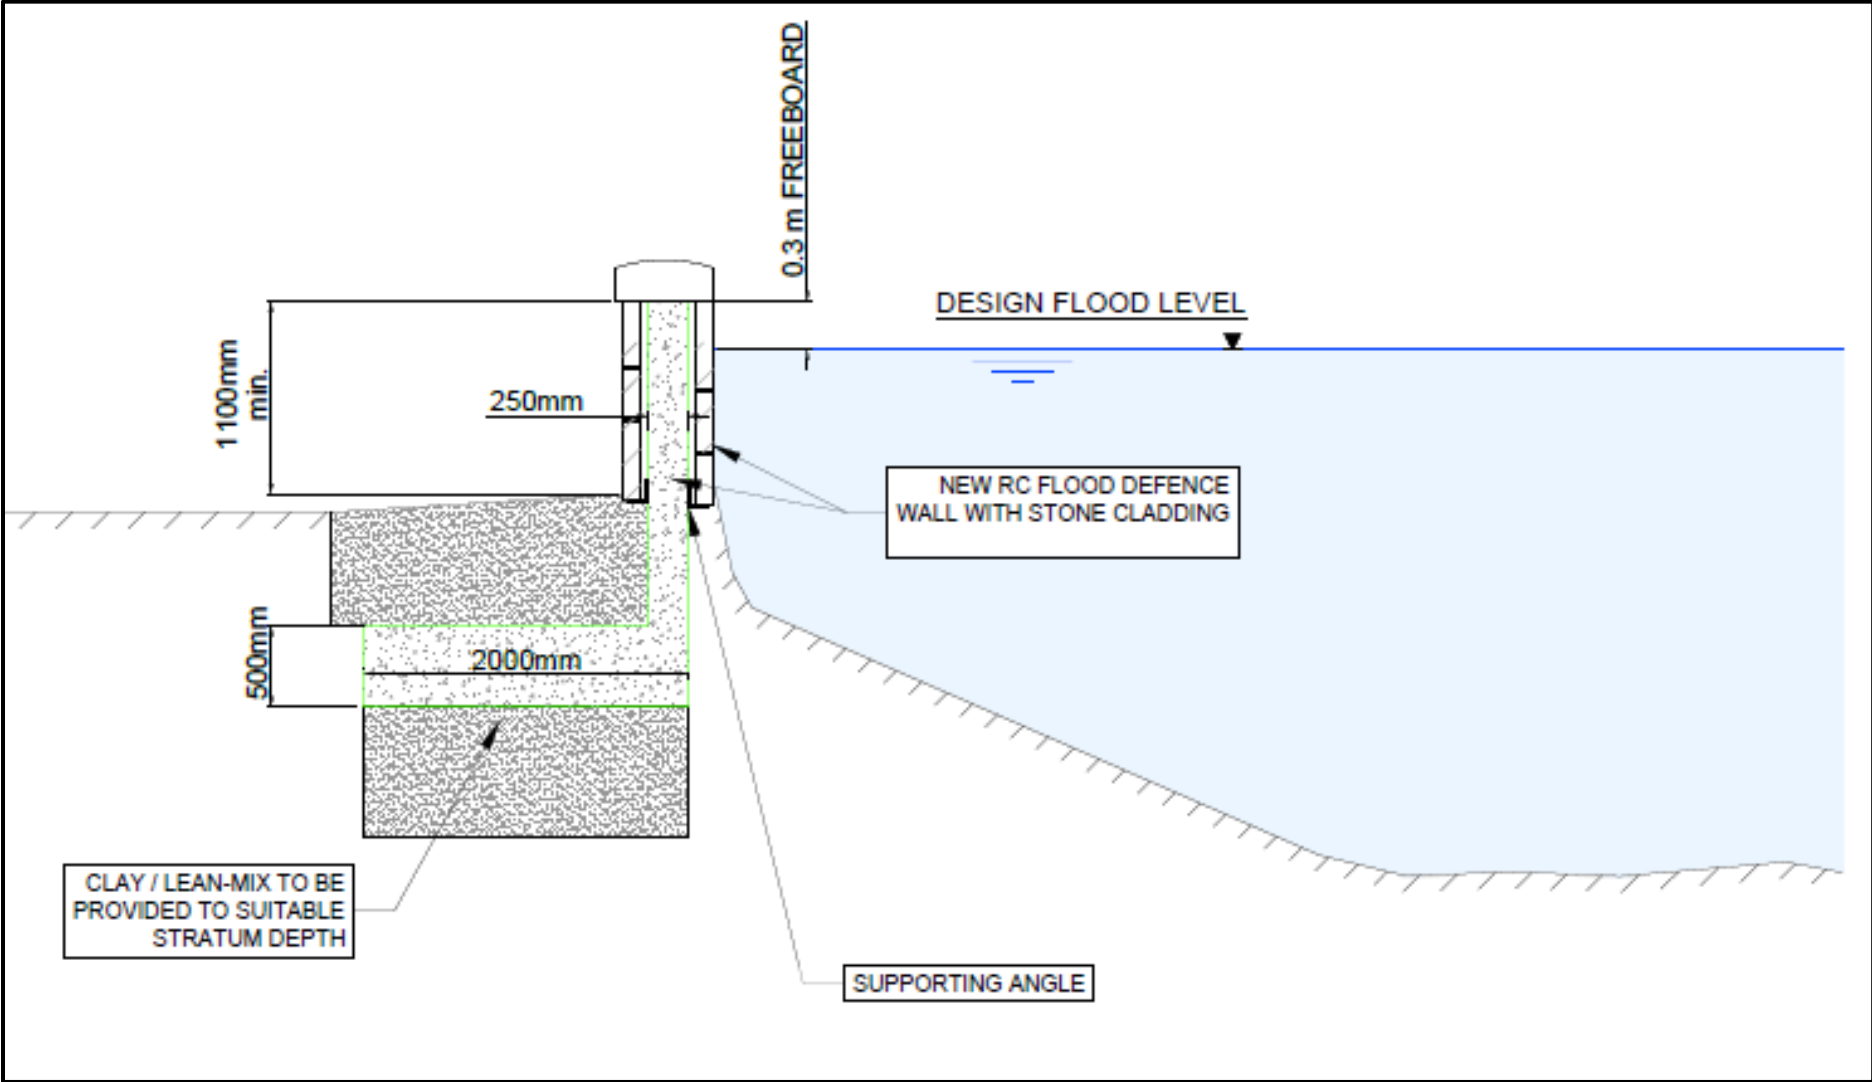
Standard Cross Section Detail of Flood Wall - River Moy
